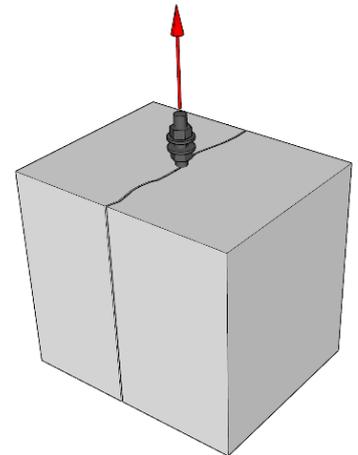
Concrete splitting reinforcement for RPP-L type base bolts
